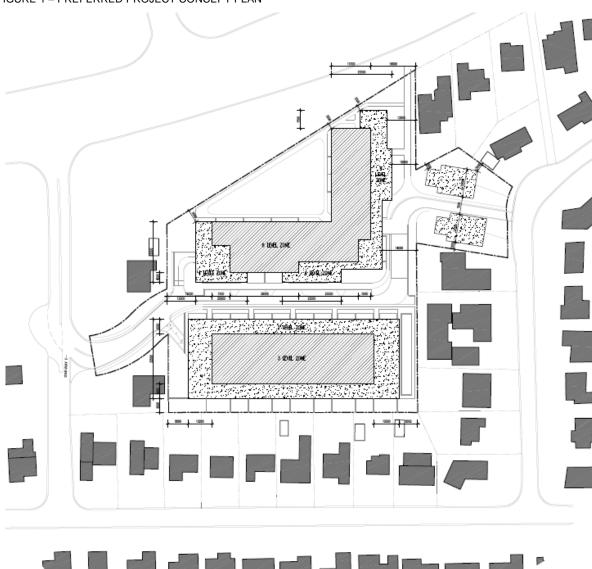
PREFERRED PROJECT CONCEPT PLAN
